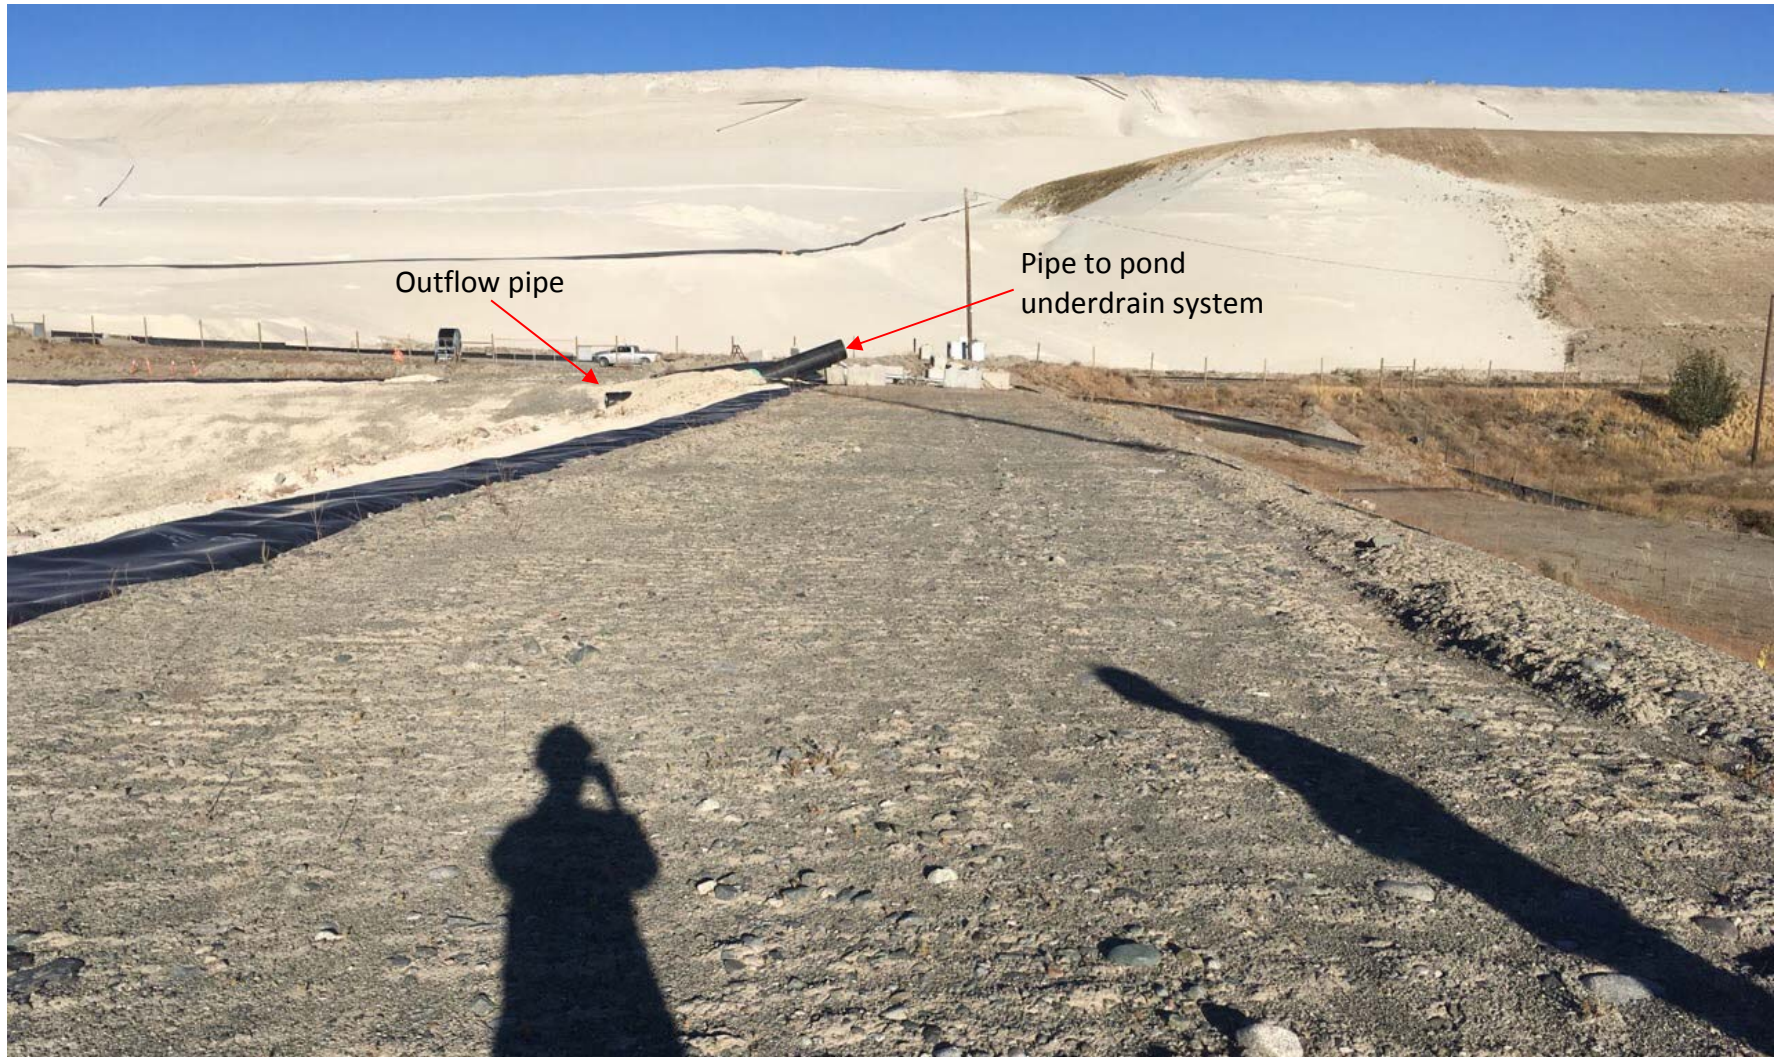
Slimes Pond 2 Downstream Face – Facing East (SS-2017-06)
